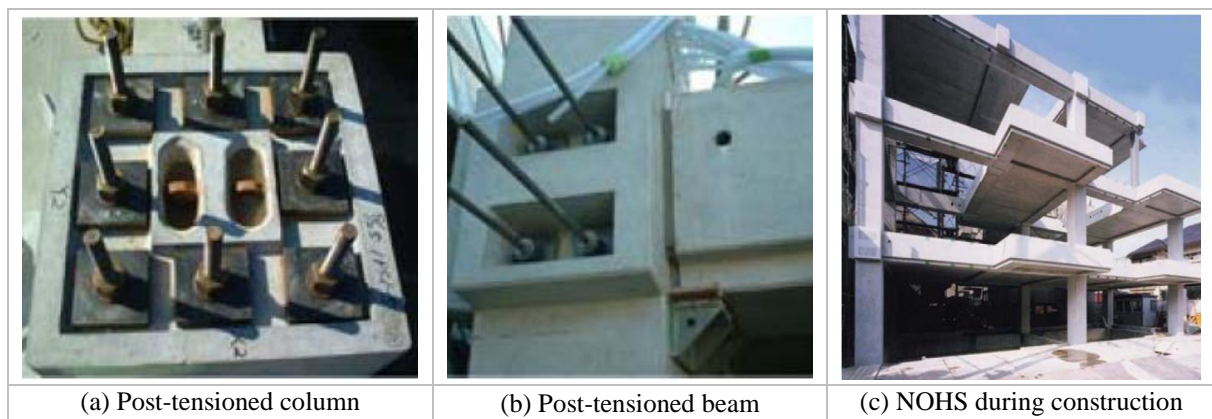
Connections of “NOHS” housing project and building during construction [52]
